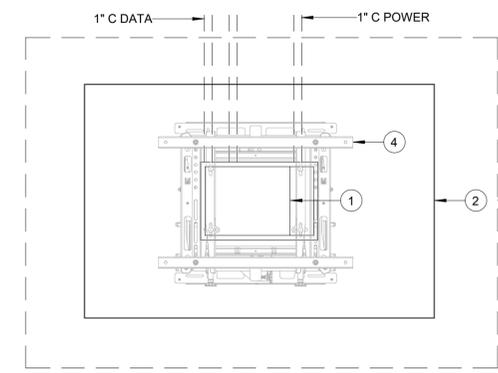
WALL BACK BOX SCALE: NTS C3
